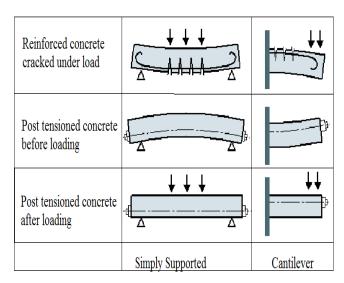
Comparison of Reinforced and Prestressed Concrete Beams
